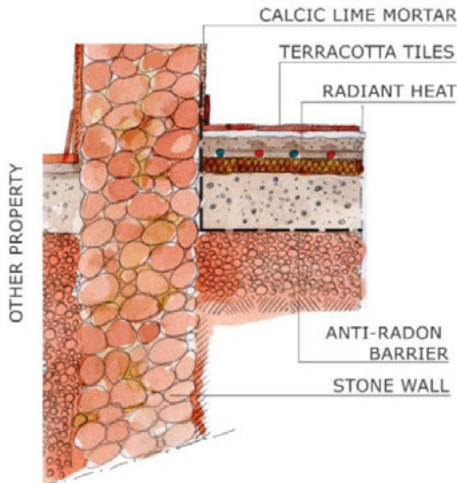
Stone walls and terracotta: detail (Li-Puma, 2021)
